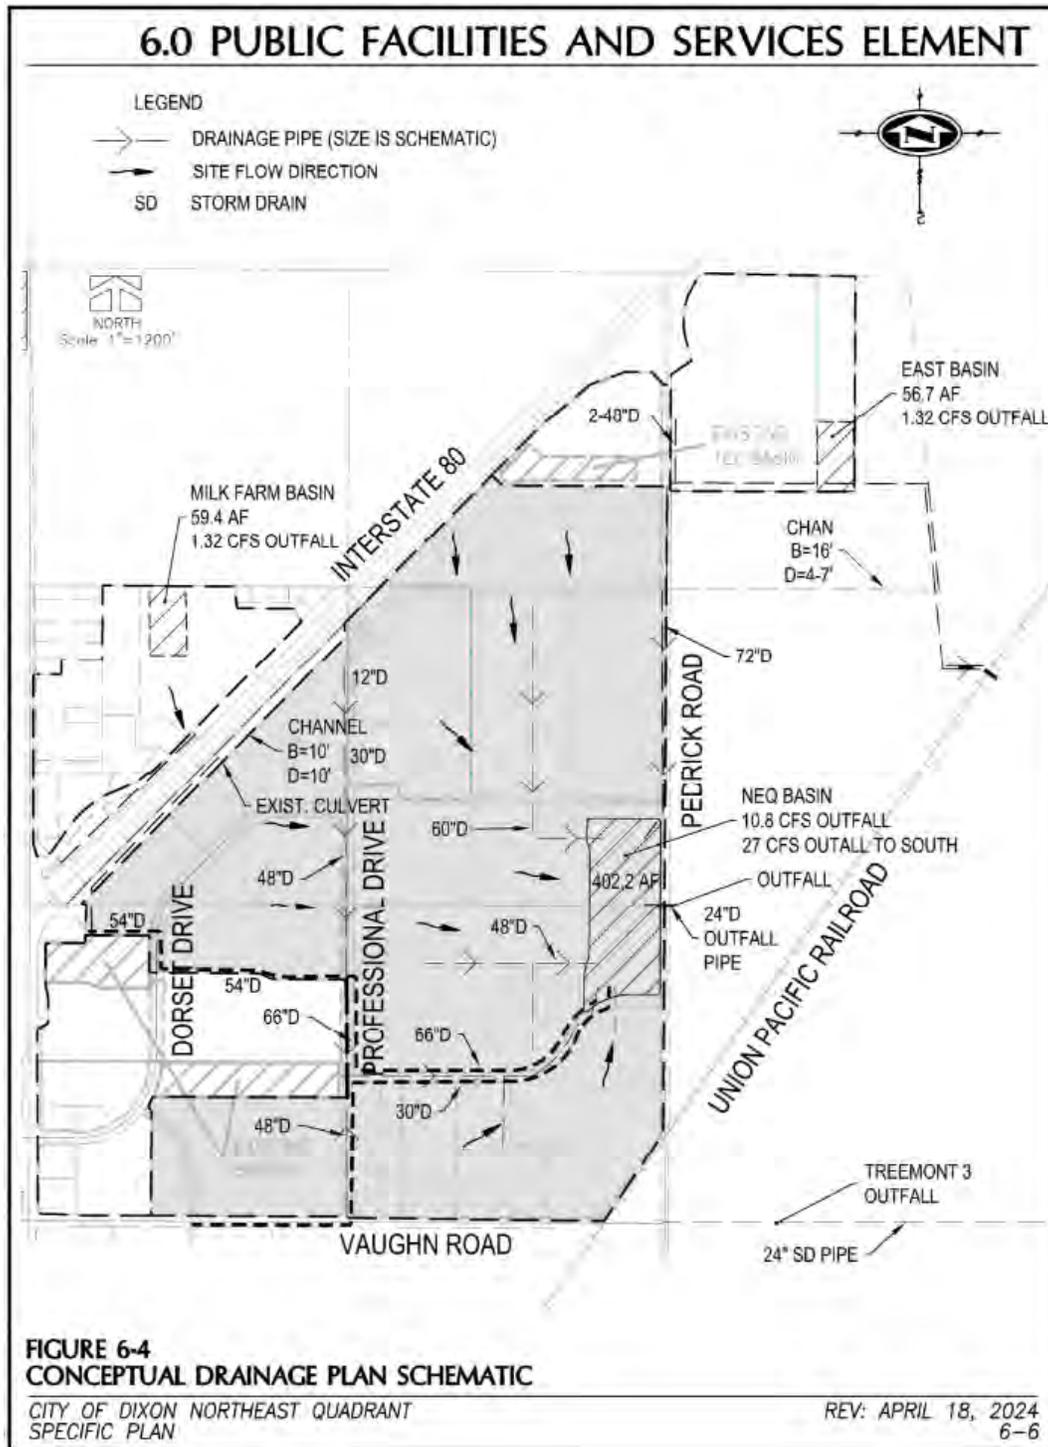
CONCEPTUAL DRAINAGE PLAN SCHEMATIC [FIGURE UPDATED 2024]
